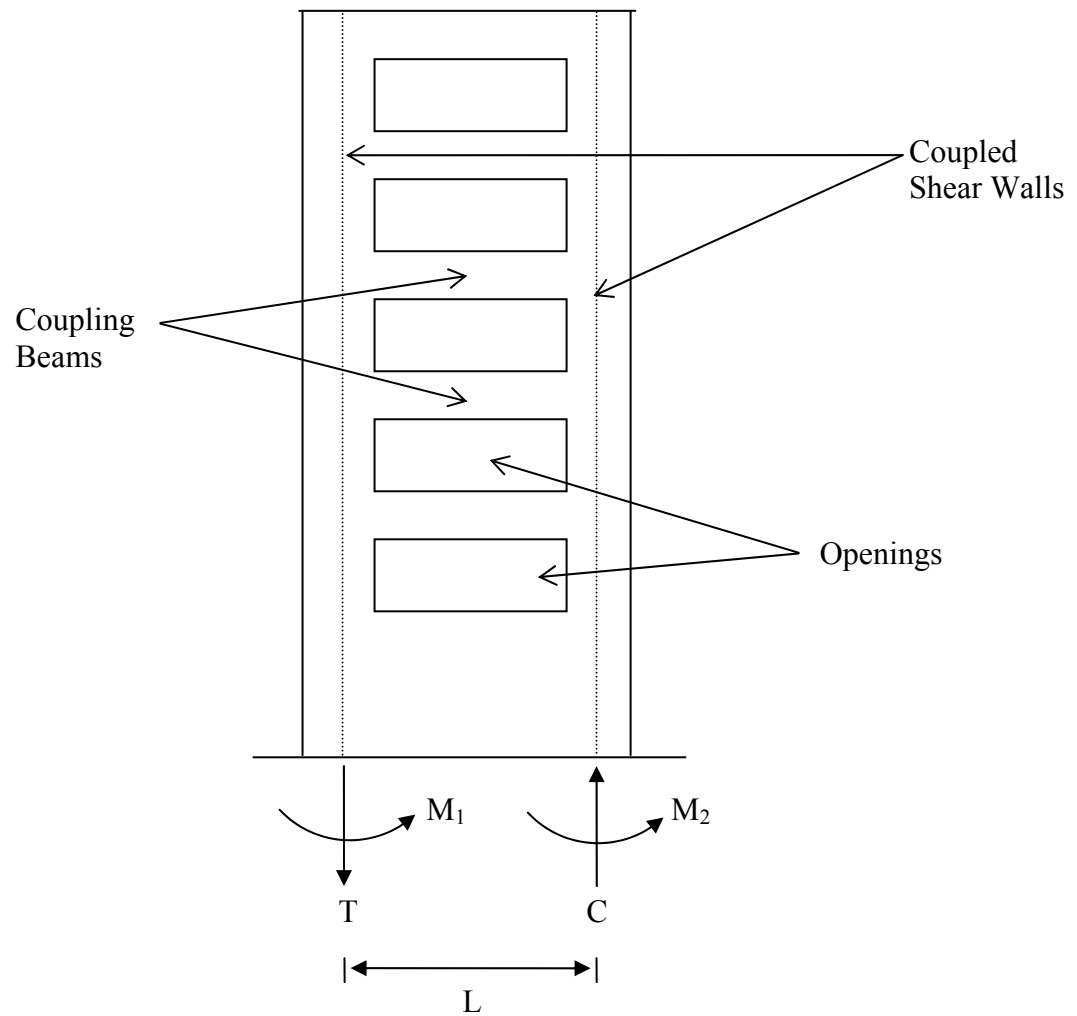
A Shear Wall System with Openings (Coupled Shear Walls)
